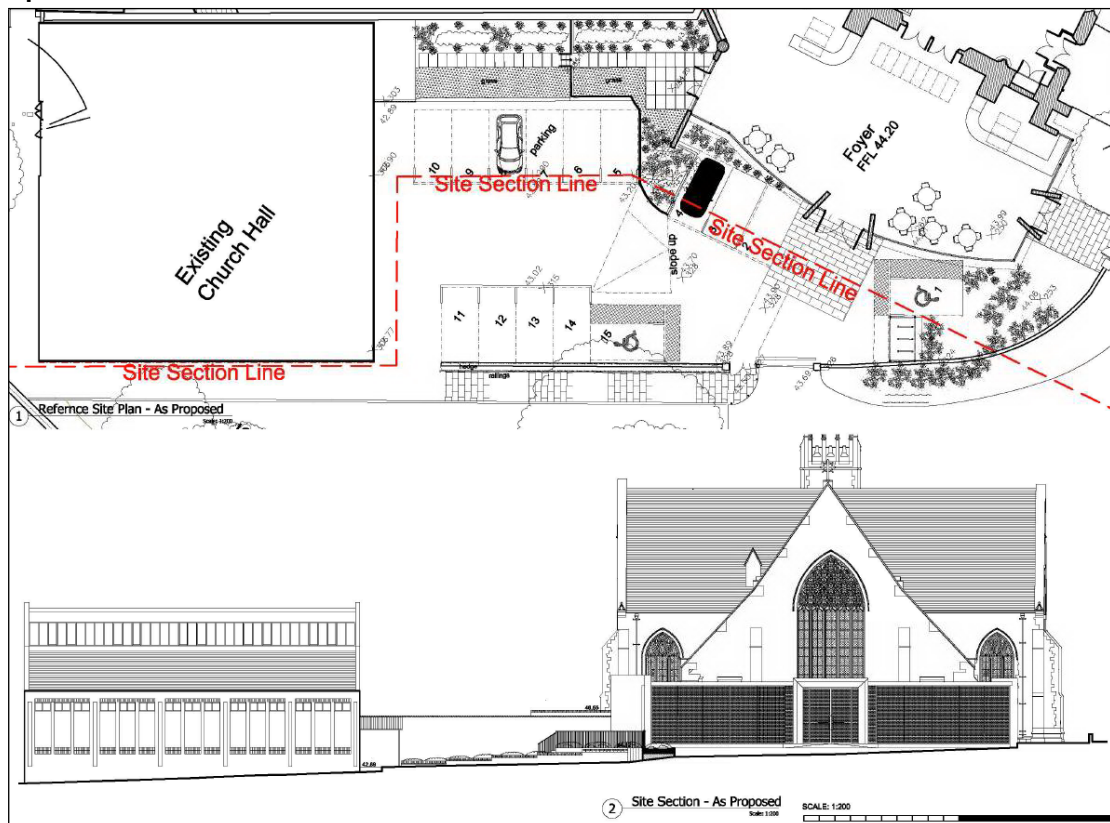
Proposed section (Greyfriars Church, Church Hall, landscaping)
